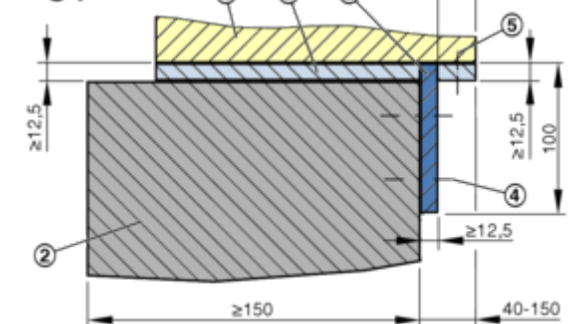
Details EK-JZ dry mortarless installation in solid wall, solid shaft wall EI 90 S
